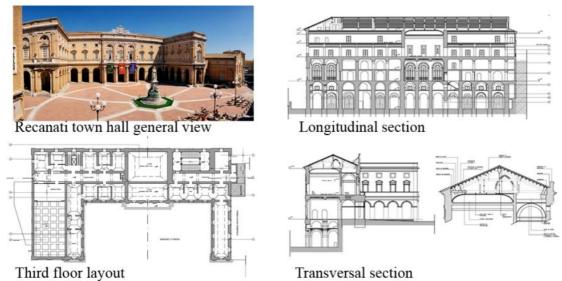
Recanati town hall: A general view, the third floor layout, longitudinal and transversal sections
